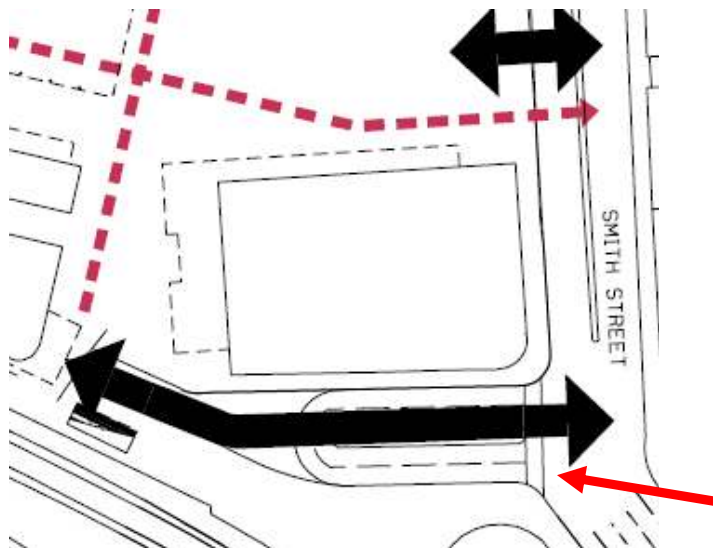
Extract from Master Plan 2003: Access to Site, drop-off/pick-up turnaround visible
